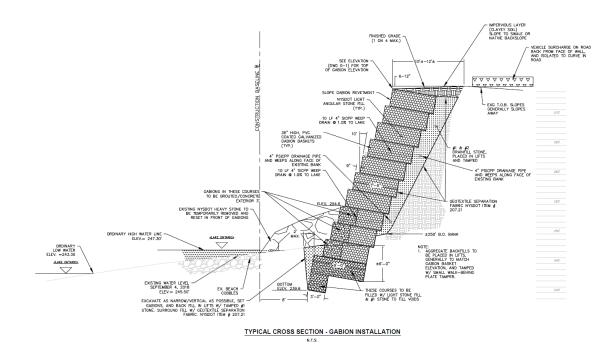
Shoreline Repair Detail Sheet – MRB Group
